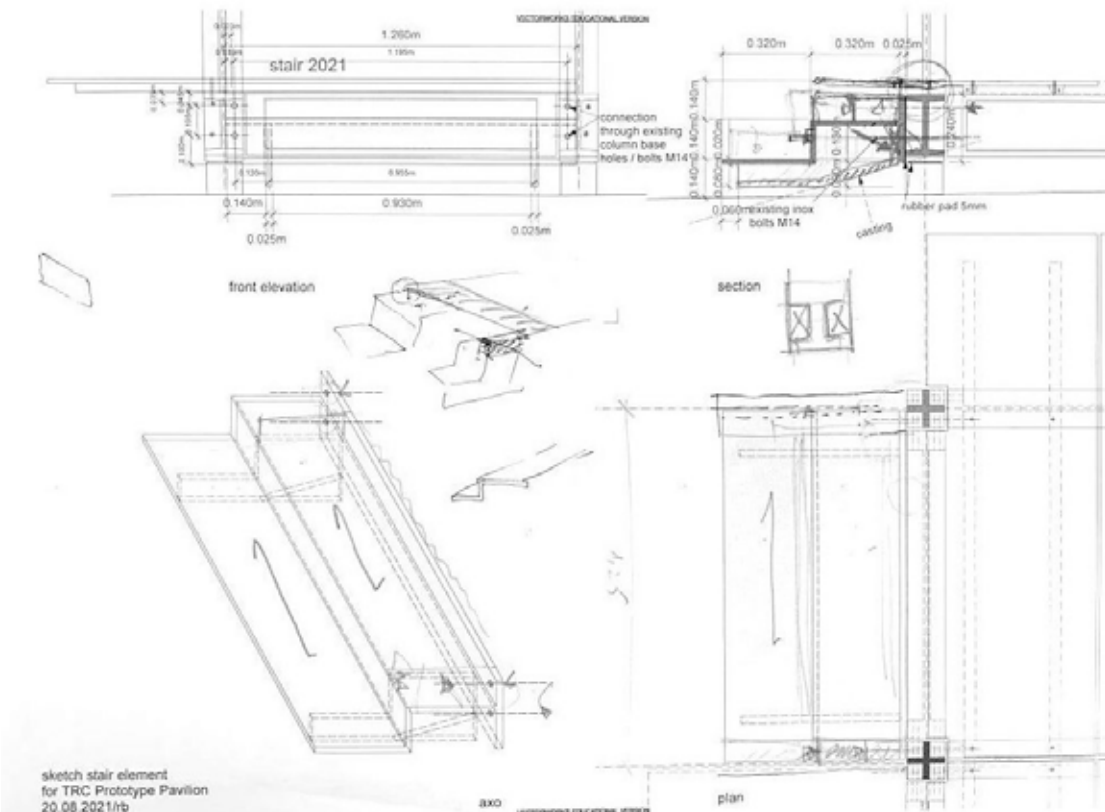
Sketches of connection details on printed drawing, 2021
